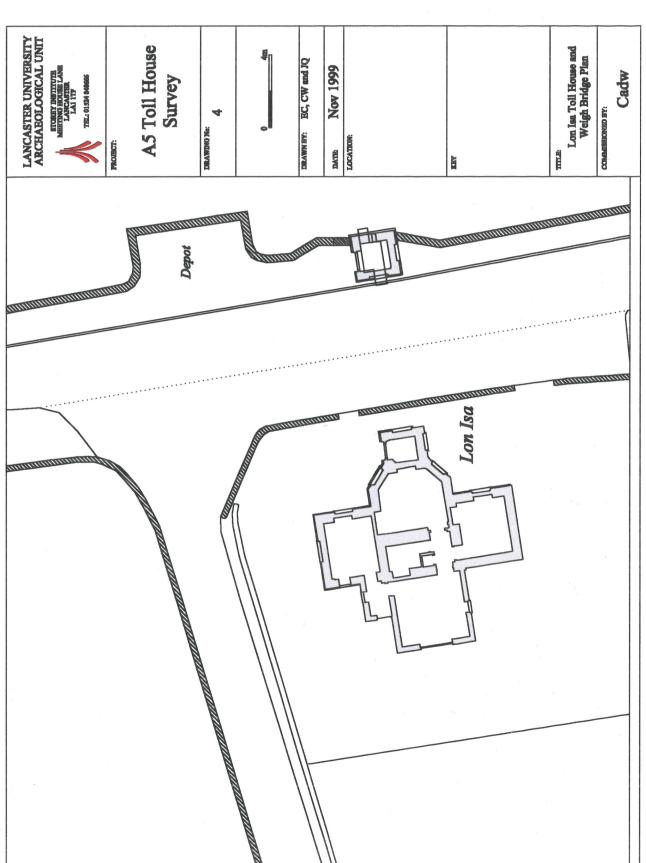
Lon Isa Toll House and Weigh Bridge Plan
